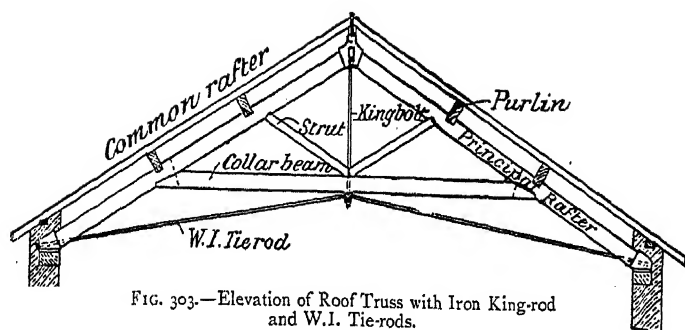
Elevation of Roof Truss with Iron King-rod and W.I. Tie-rods.
